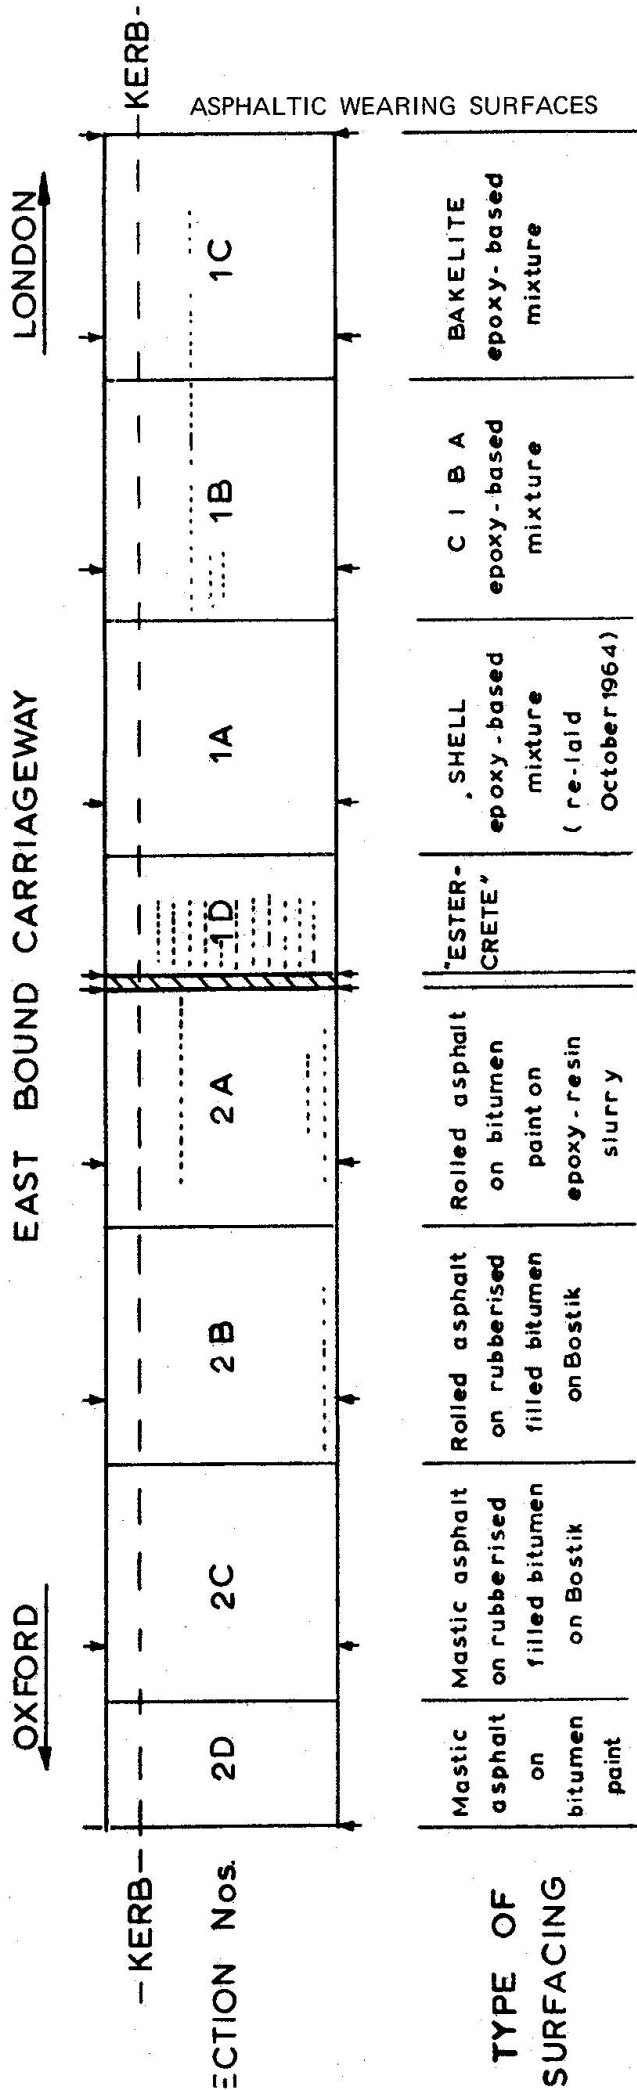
DETAILS OF DECK PANELS INSTALLED ON TEST SITE
